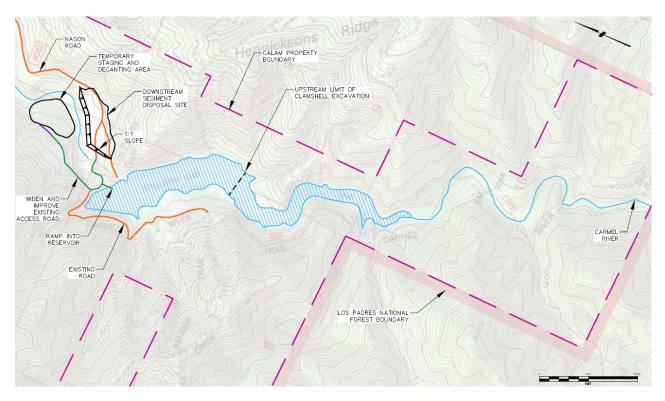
Potential Downstream Disposal Site from MWH (2013)
